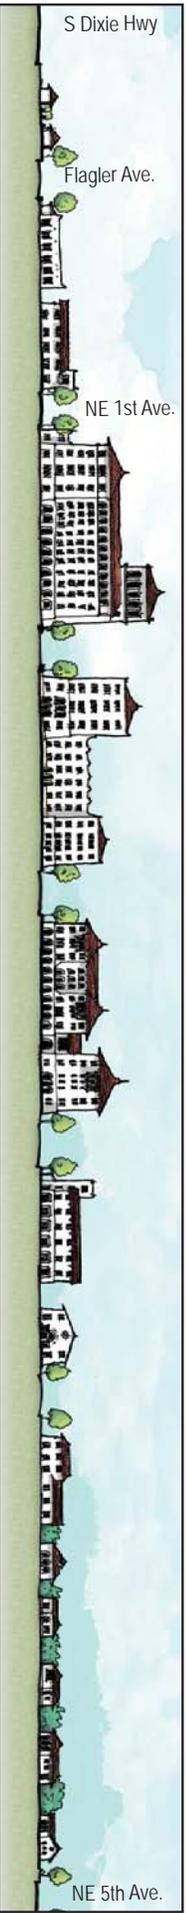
Section through Old Pompano from S. Dixie Hwy. to NW 5th Avenue
